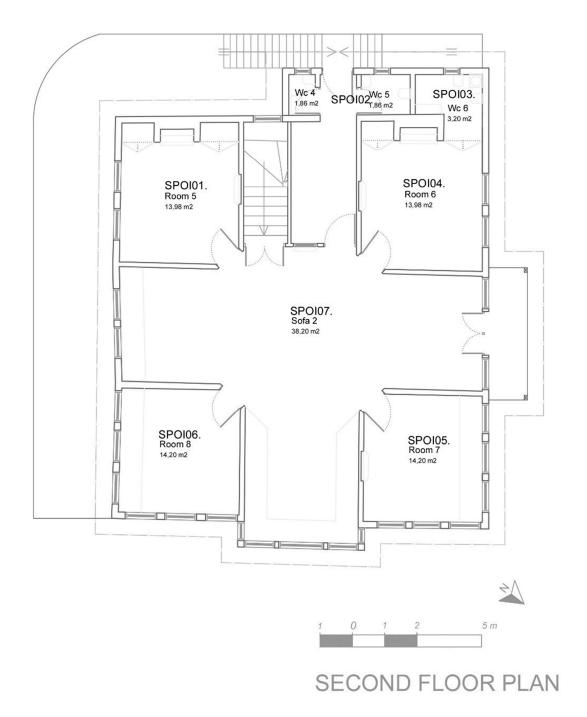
Post-intervention second floor plan of Kadirler house (Author, 2023)
